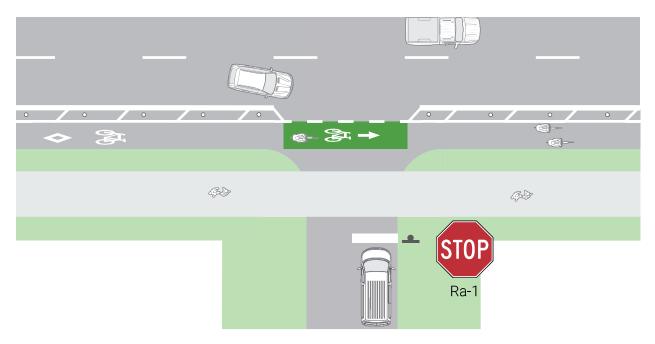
High-Volume Driveway Treatment, On-road Facility
